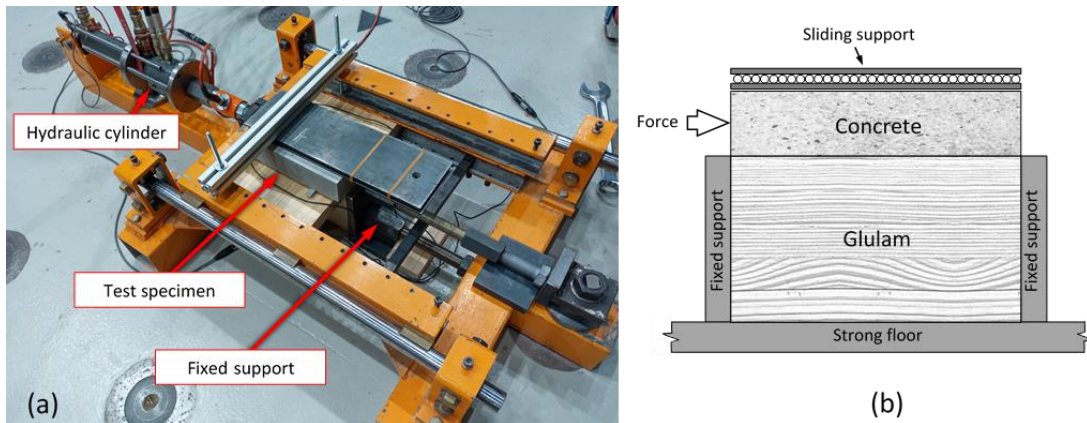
(a) The push-out test set-up used and (b) the side-view of a specimen under loading.
